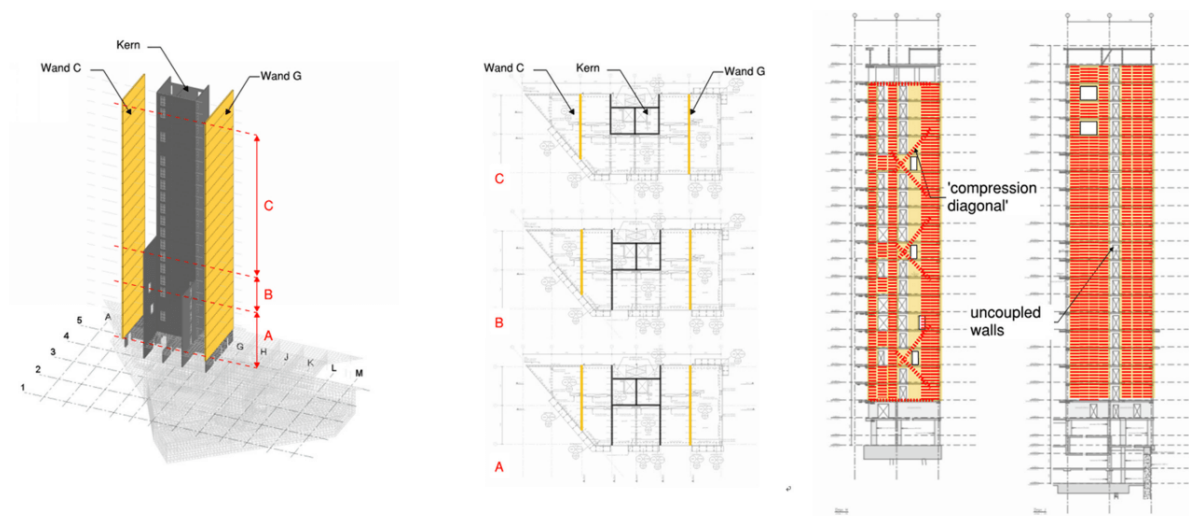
Concrete core and CLT stability walls of HAUT[64]
